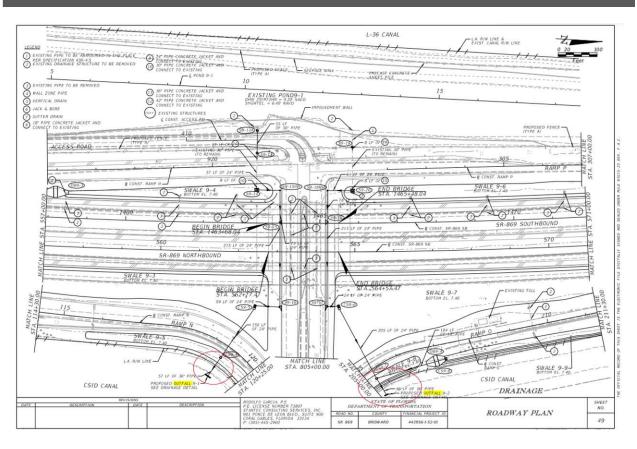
Example of Roadway Plans Showing Proposed Outfall Locations.
